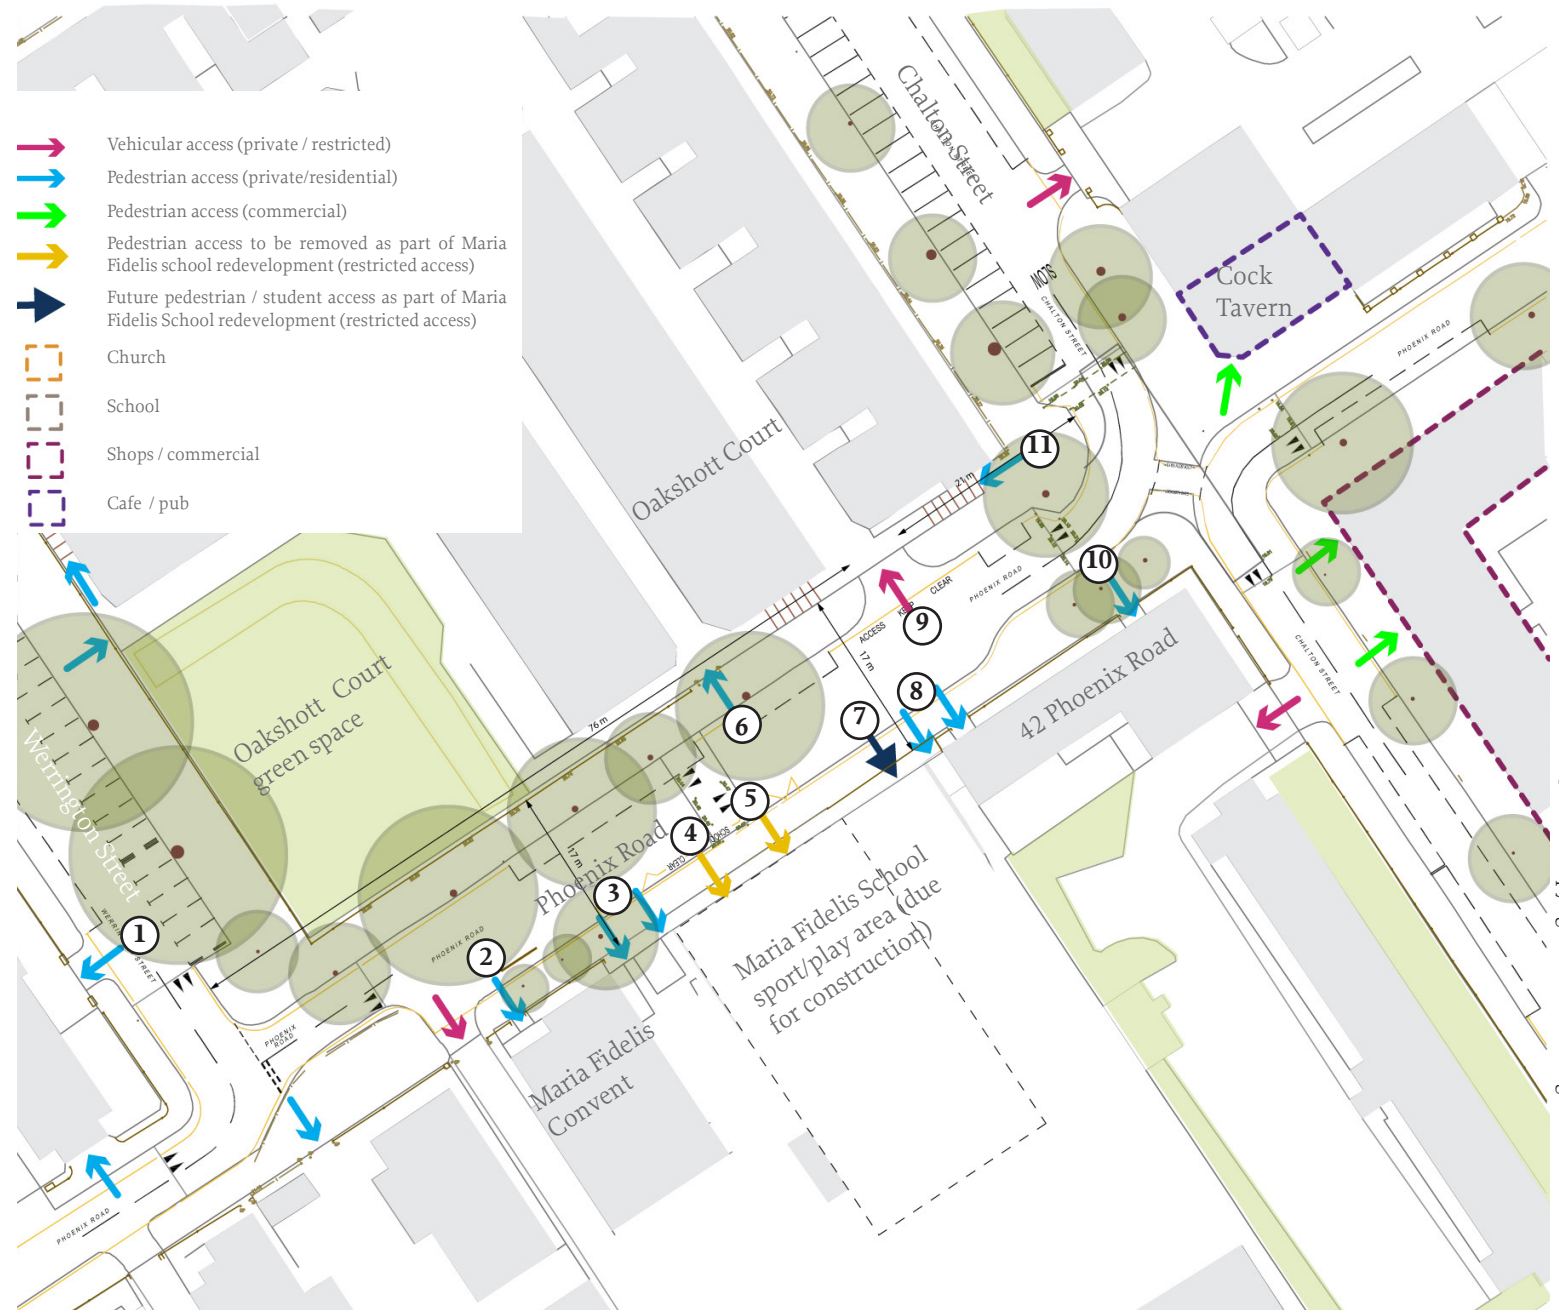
Access and circulation constraints on Phoenix Road, section between Werrington Street and Chalton Street
